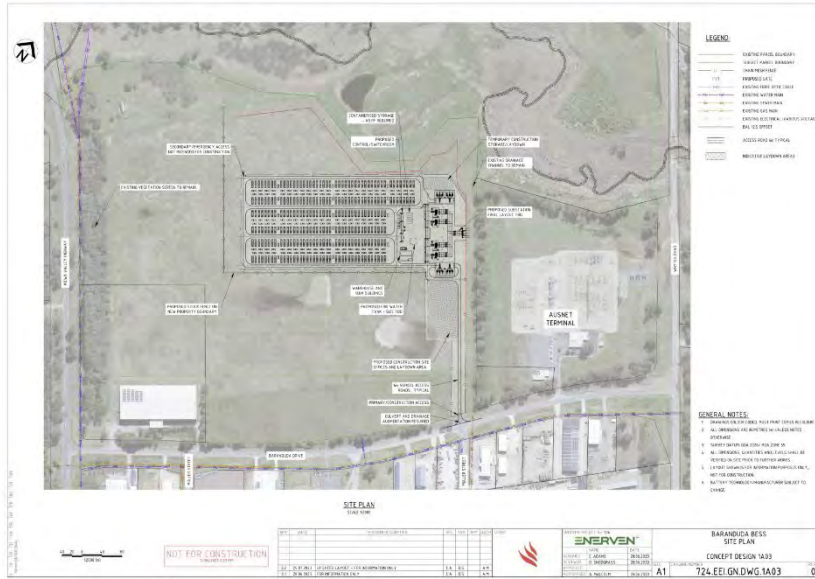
Site plan for the Baranduda BESS (Enerven, 2023).
